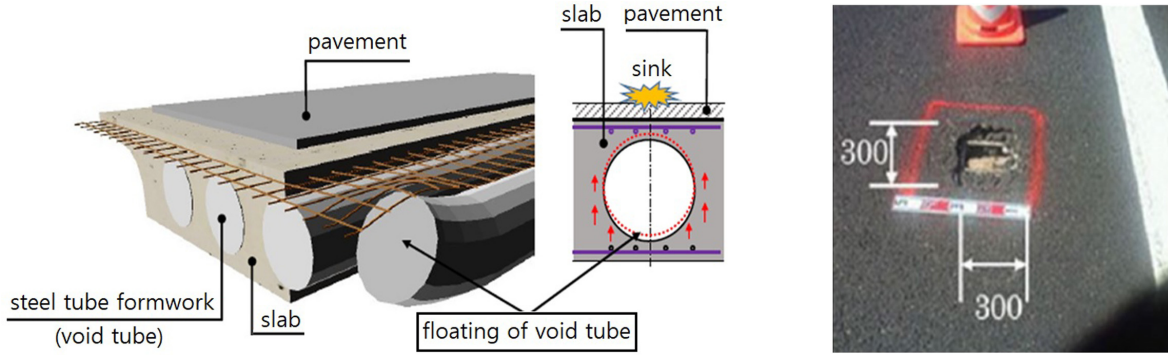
Void tube floating and sunken pavement at a voided slab bridge.
